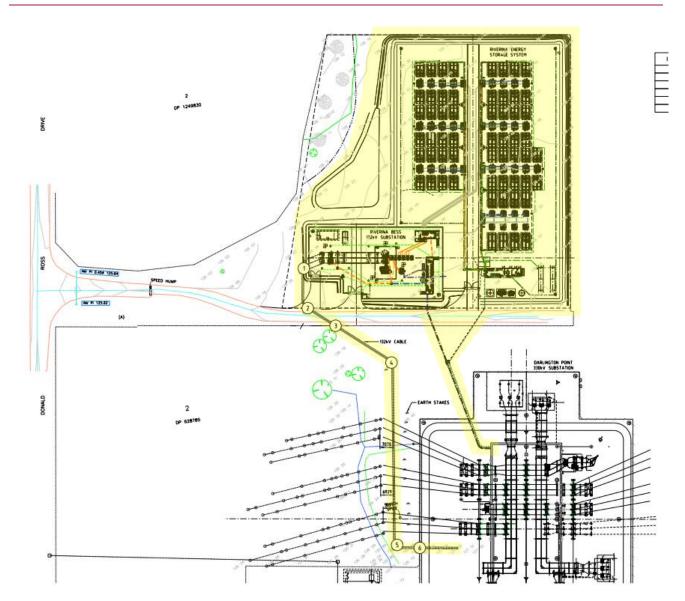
BESS and RBESS Sub construction layout on Lot 1 DP1249830 and connection into the TG DP Sub via 132kV underground cable, control and communications conduits on Lot 2 DP628785 (Project works highlighted in YELLOW)
